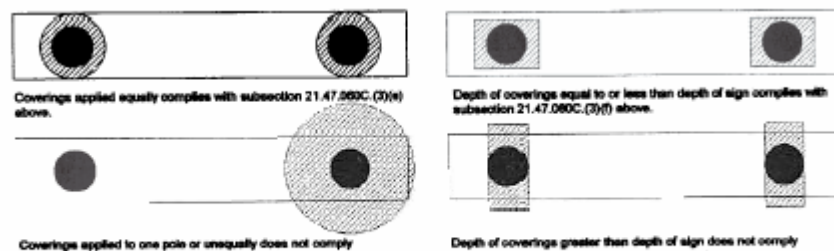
Examples of pole wrap. Poles depicted in plan view.
